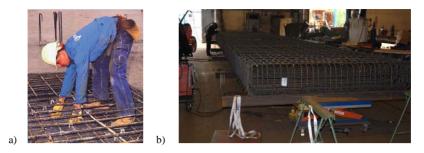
a) Traditional working position when placing reinforcement piece by piece. b) Steel reinforcement prefabricated in the factory and shipped to construction site.
